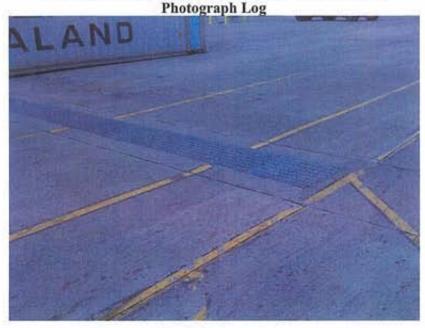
Trench drain outlet and scouring at the northeast corner of Pier P-7
